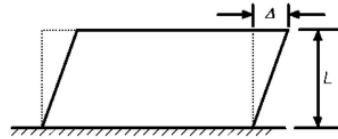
Story Drift in Structural Wall Where Shear Dominates Inelastic Response
